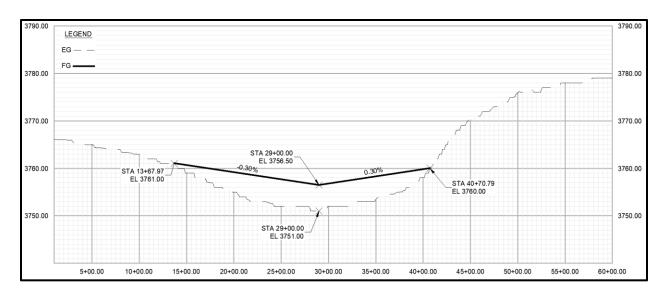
Proposed 1% LOS upstream cross section at Hill and 46th at Playa Lake 57.
